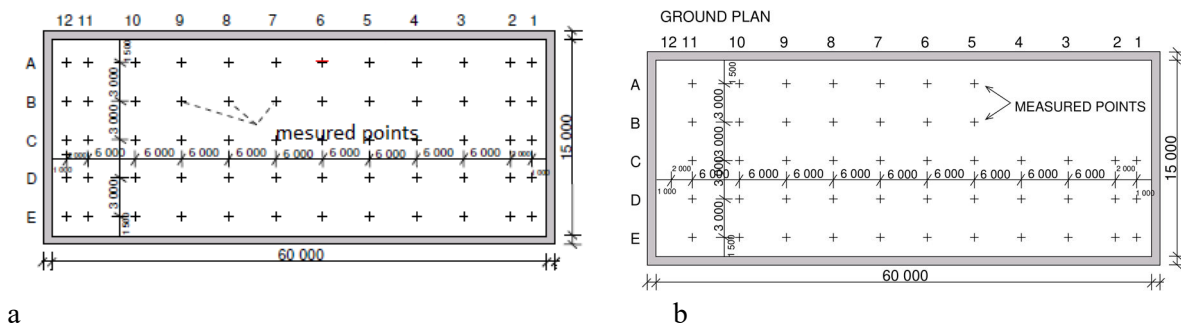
Plan of the hall; (a) – original hall, (b) – reconstructed hall.
